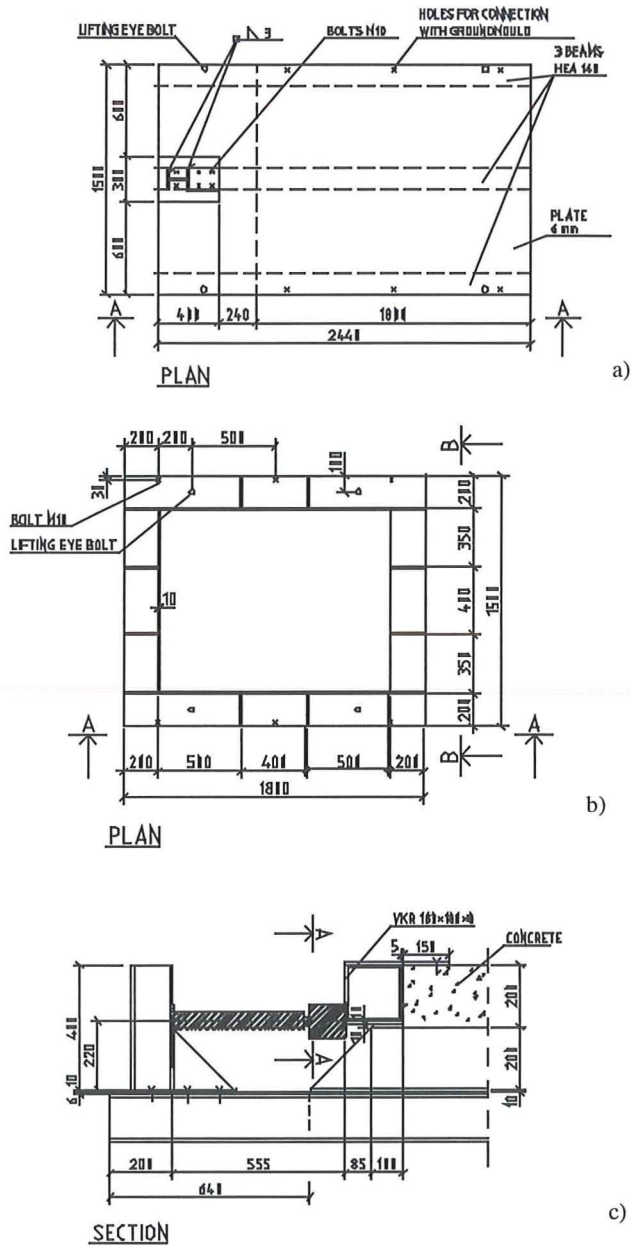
Plans and section for the test equipment¹ a) bottom board
